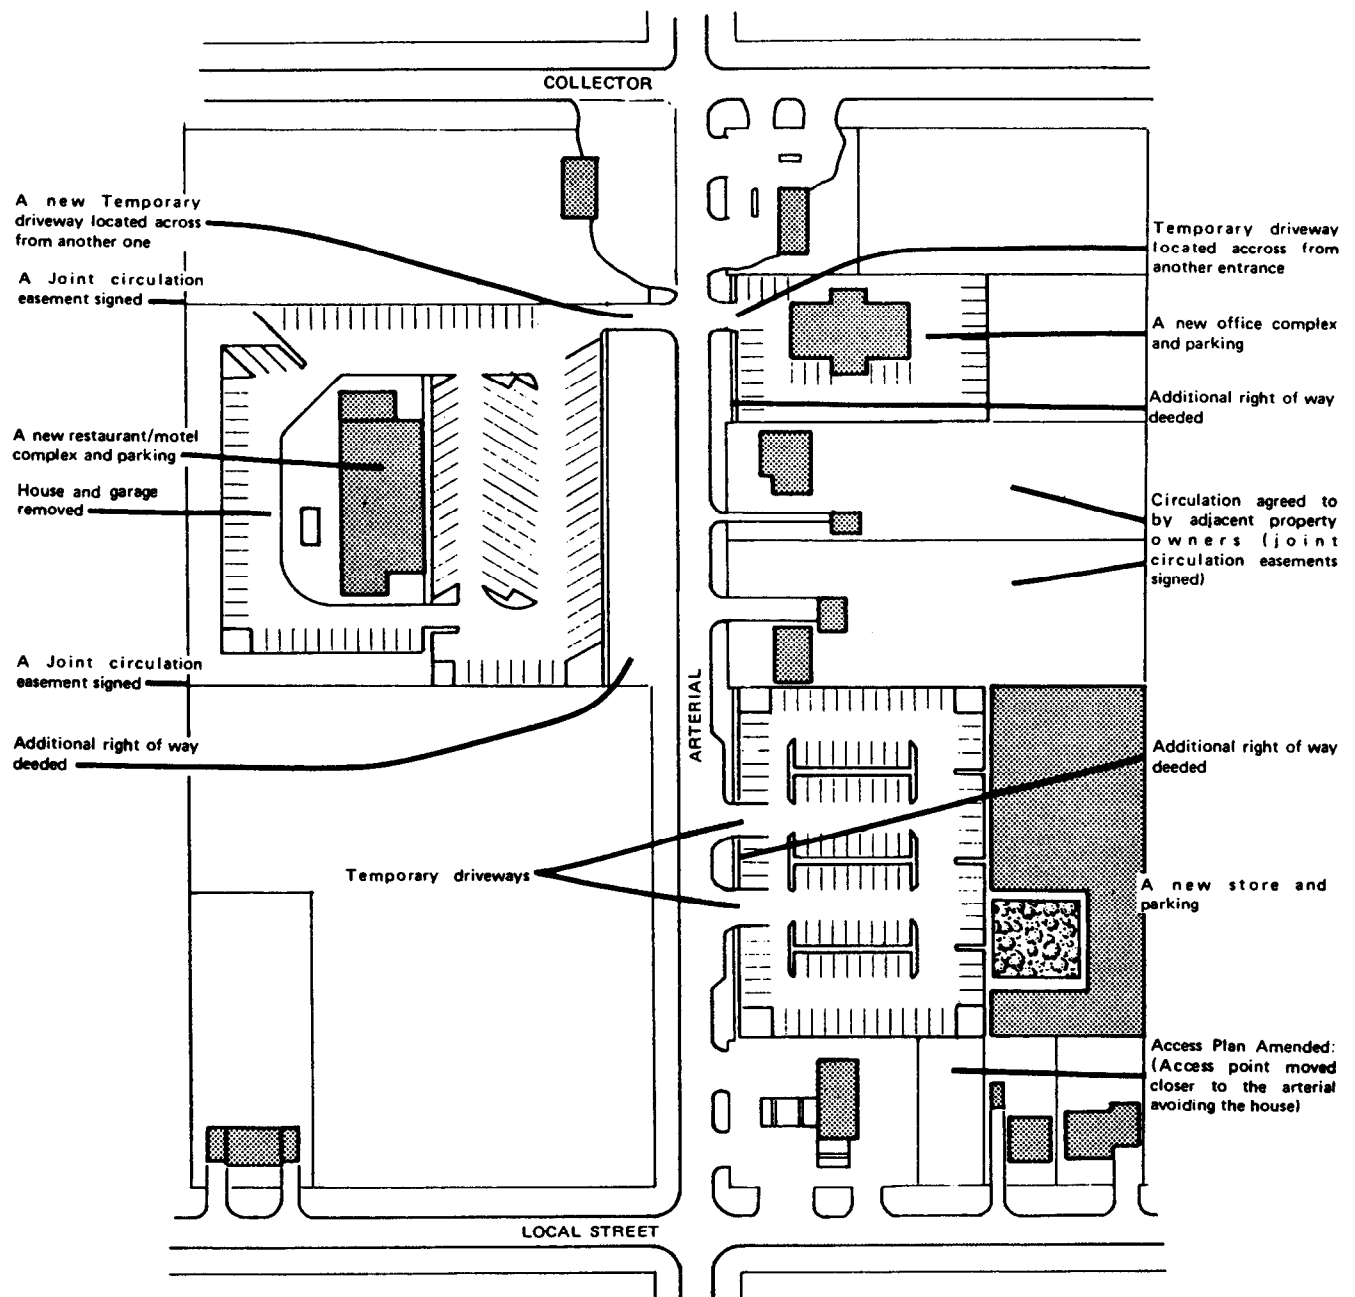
Access management plan — 5 years after plan approval. (Source: Oregon Department of Transportation)
